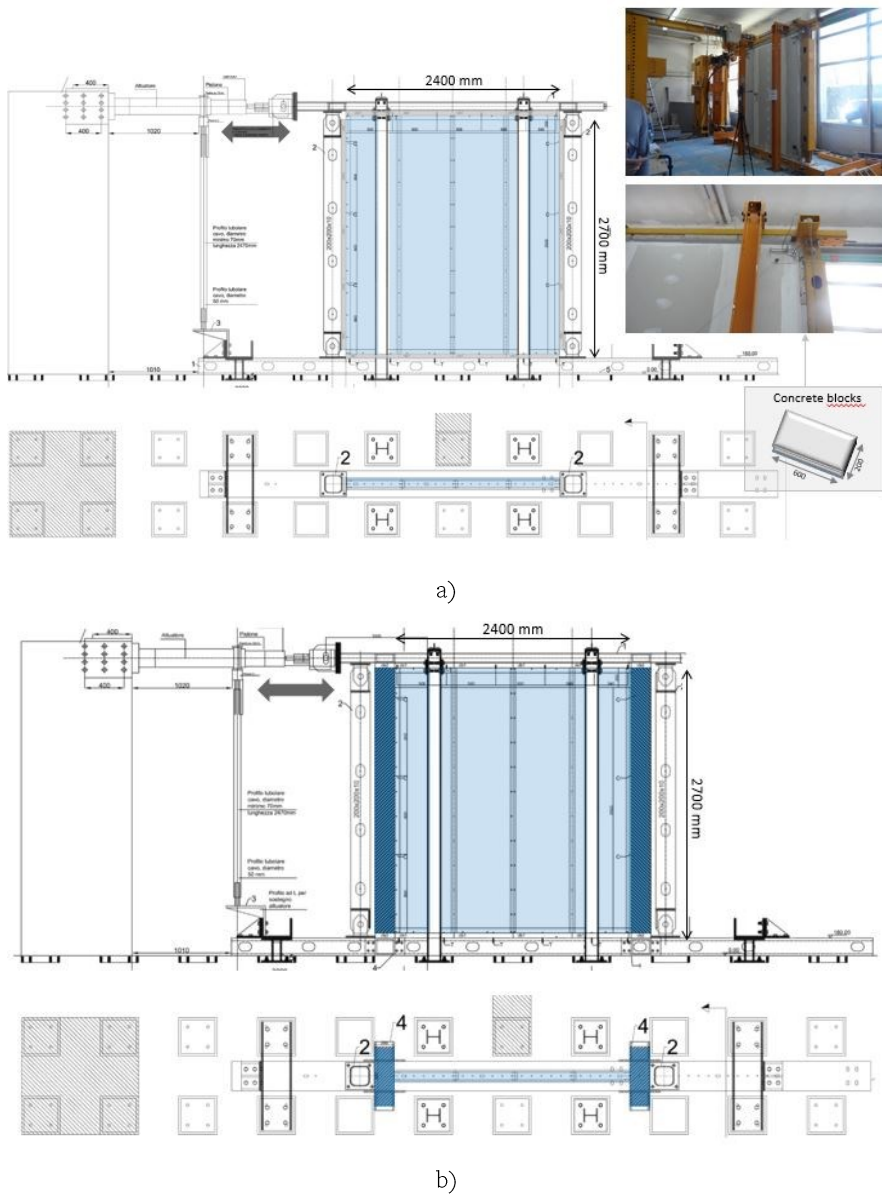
Test set-up for in-plane tests for: a) single partition wall; b) subsystem composed by an interior partition wall and two exterior walls
